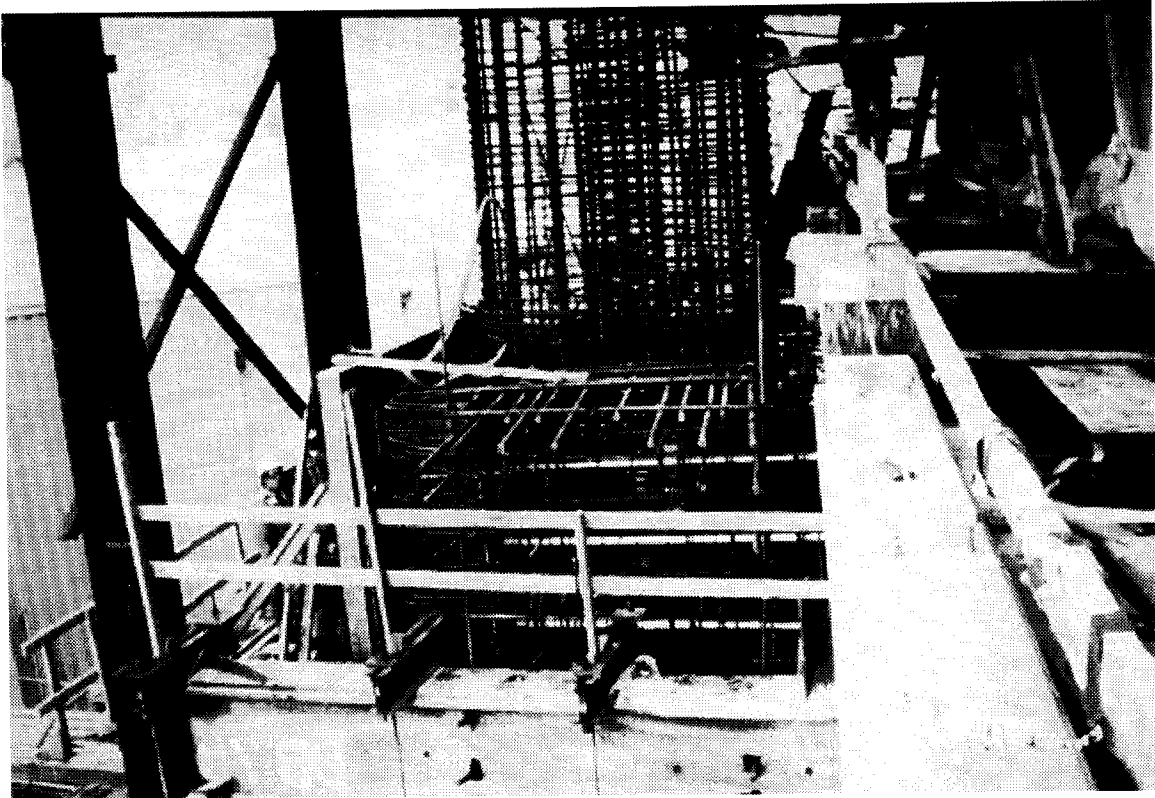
Reinforcing Steel Pattern for Beam-Column Joint
